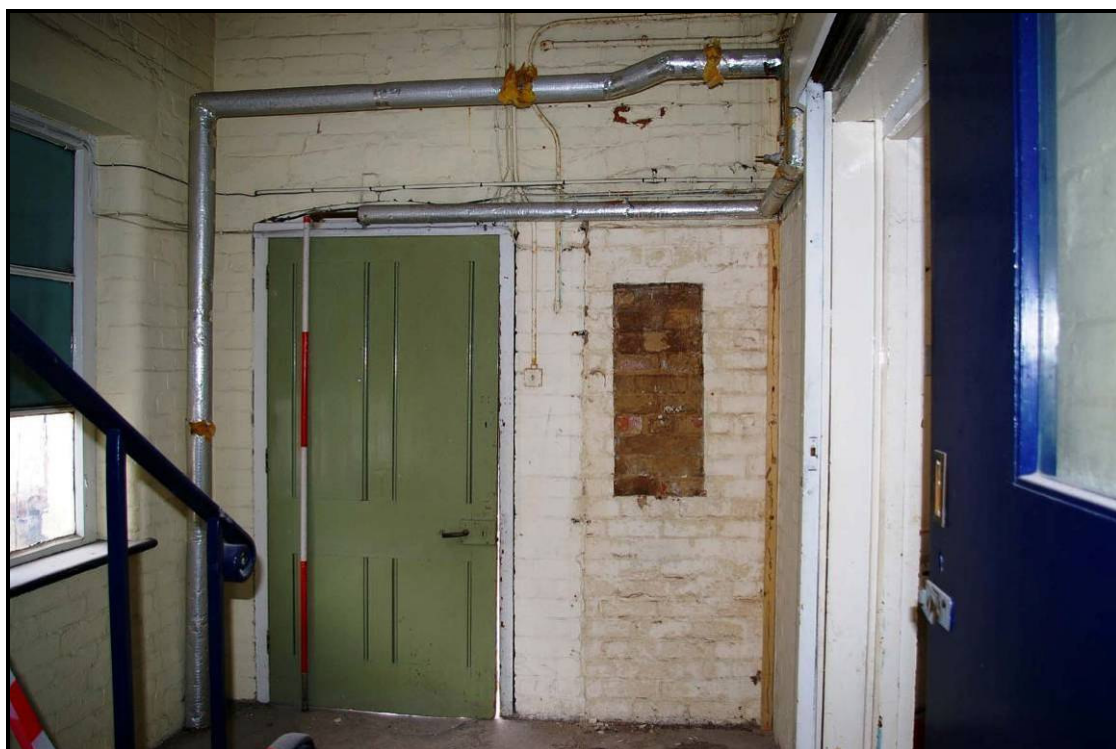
Doorway to roof of Building O on the east wall of the first floor of Building R
